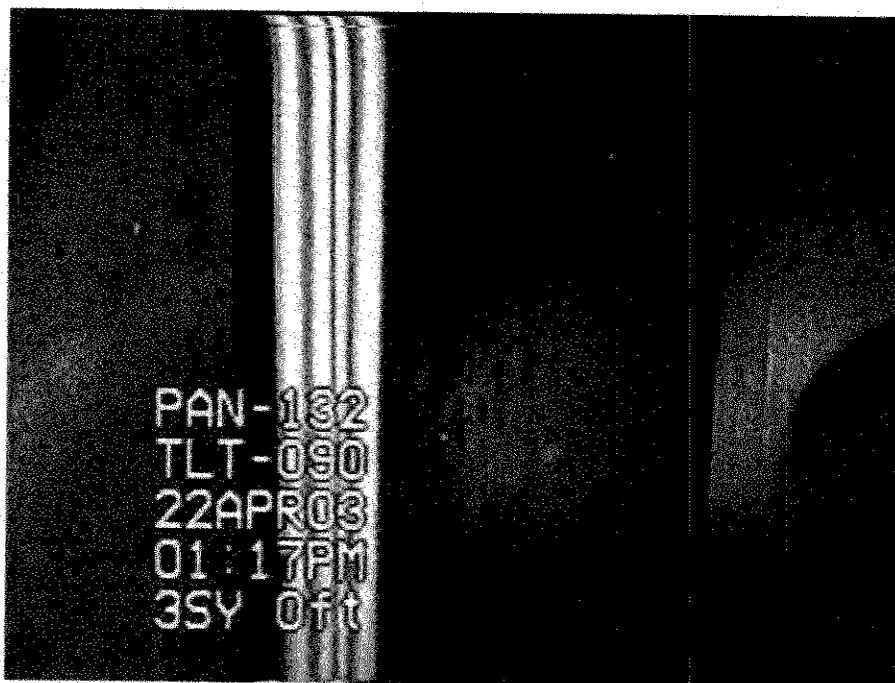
SY-103 Riser 46, Secondary Tank Wall (Left, 2003)
